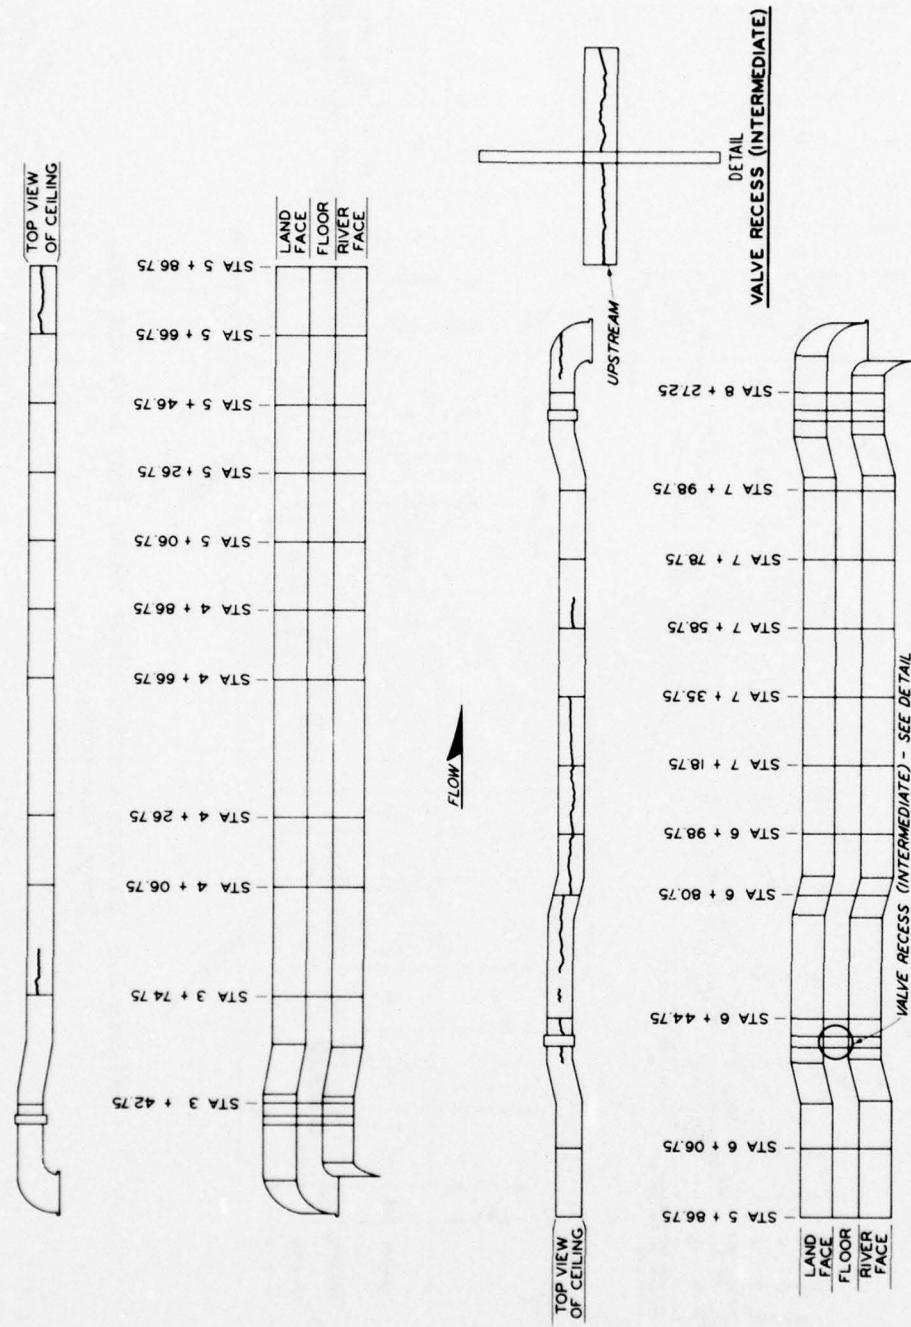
Surface cracks, landwall filling and emptying culvert, Troy Lock and Dam, Troy, New York.
